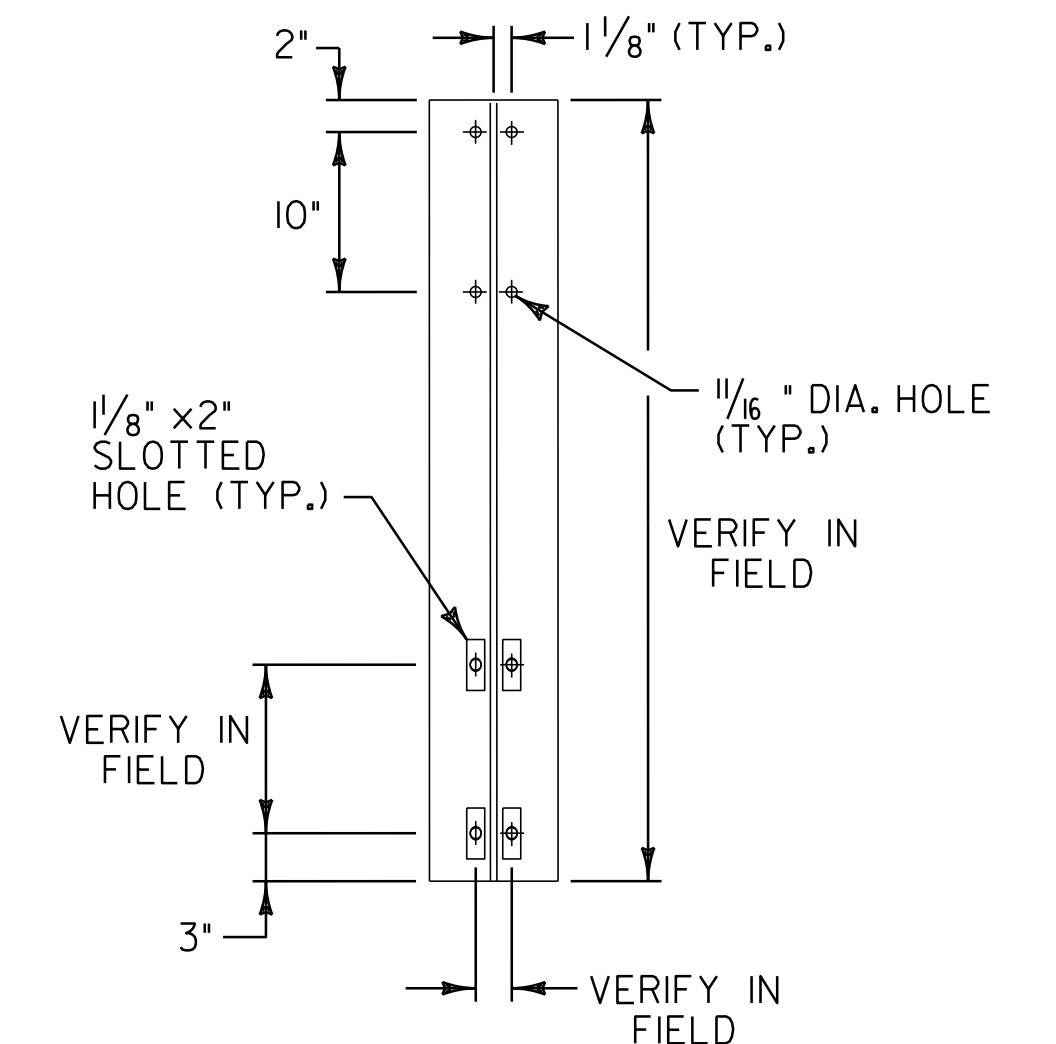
DETAIL FOR BURIED STEEL BEAM GUARDRAIL ENDS IN BACKSLOPES WITH RUB RAIL
